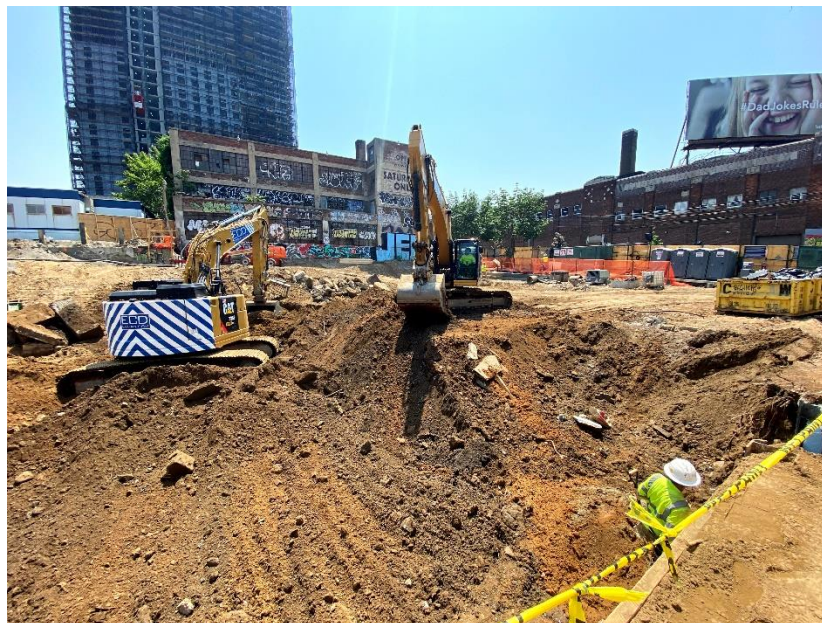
View of excavation in northwestern part of the site, facing southeast.
